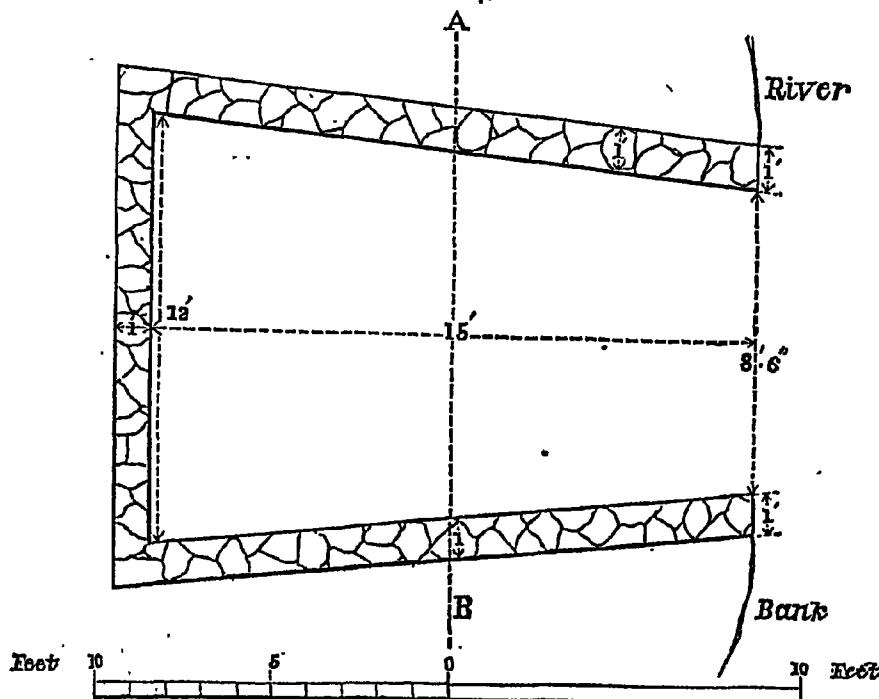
shows the plan of an empty lime kiln. The walls are usually made of boulders set in mud mortar. The base of the kiln slopes inwards.
